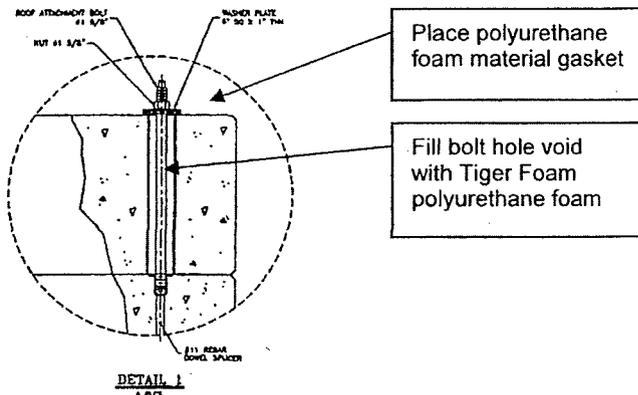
Drawing- Roof Sleeve, Bolt, Plate Steel Washer, and Nut
